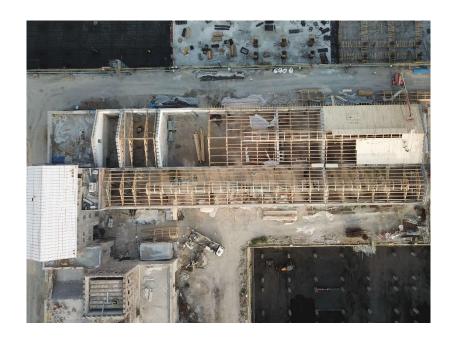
Roof system of Building 1 and 2 (Source: Grid İnşaat)
